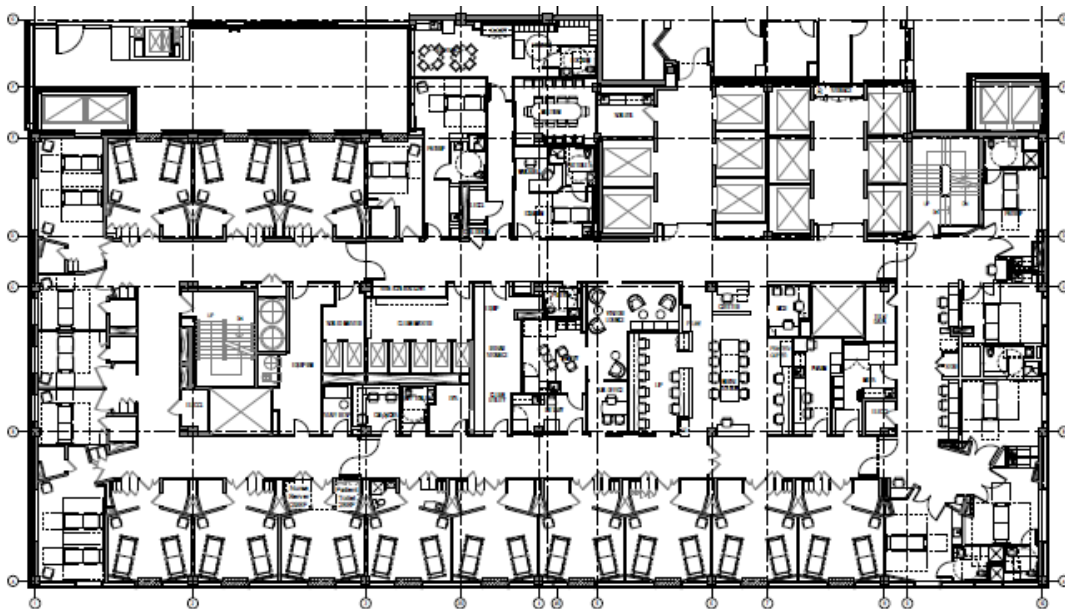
Stage 5 pilot site 3 schematic design plan
